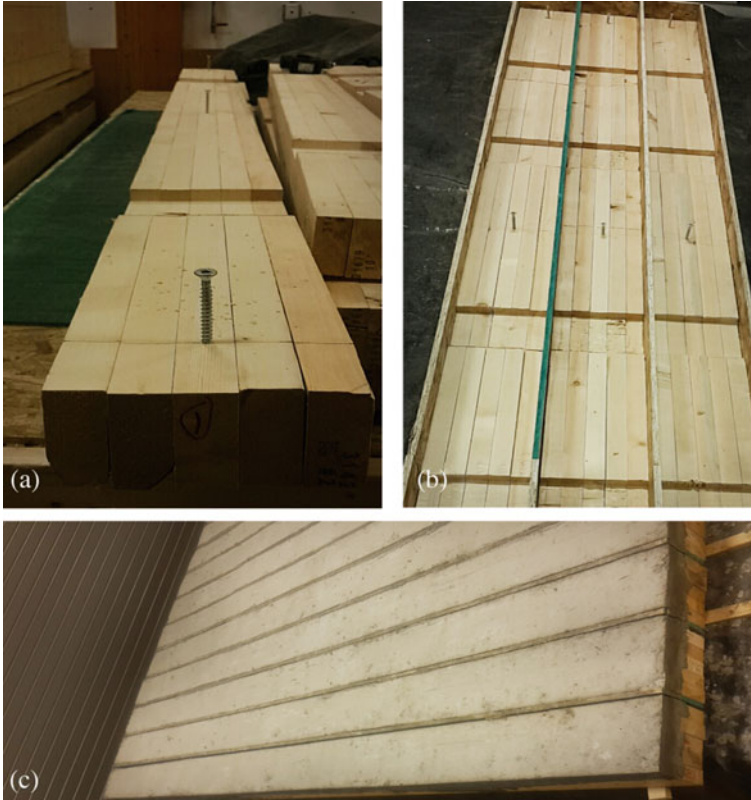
Preparation process of the specimens: a specimen with notches cut and self-tapping screw, b specimens ready for casting of concrete, c final specimens after curing of the concrete
